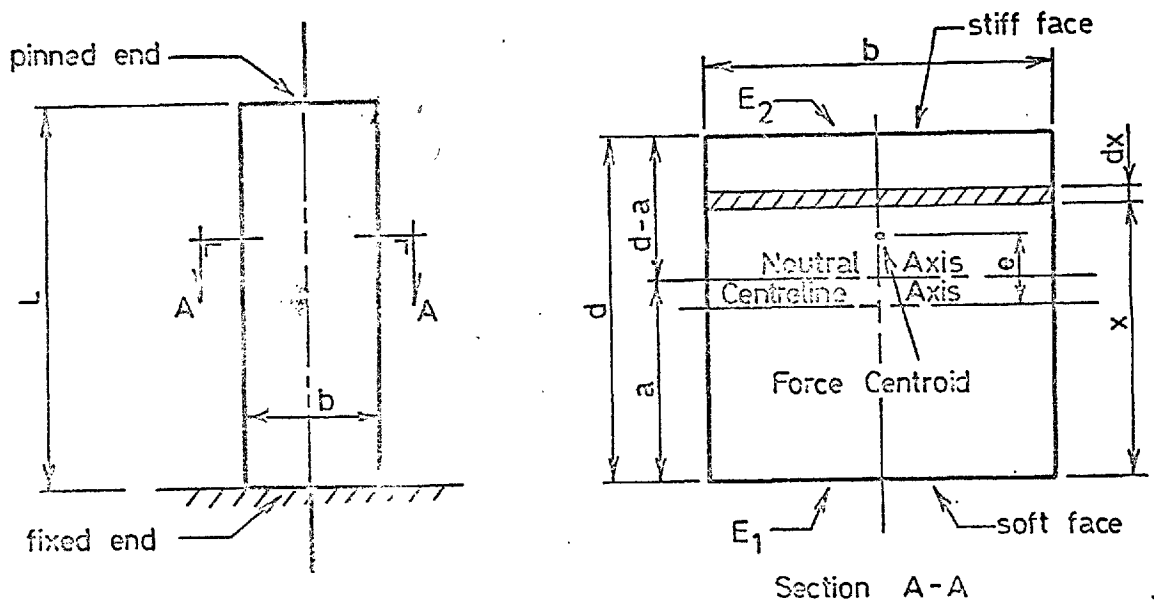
ELEVATION VIEW AND CROSS-SECTION OF SPECIMEN
